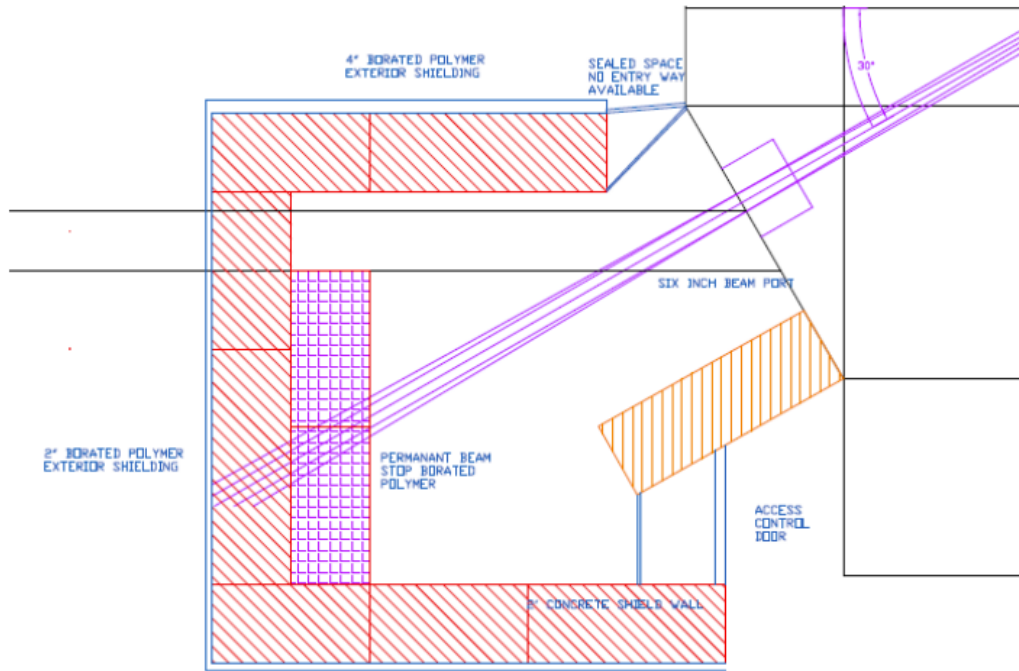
Plan view of the beam port facility showing the six-inch beam port channel, borated polyethylene shielding layers, concrete shield wall, and access control door [1].
